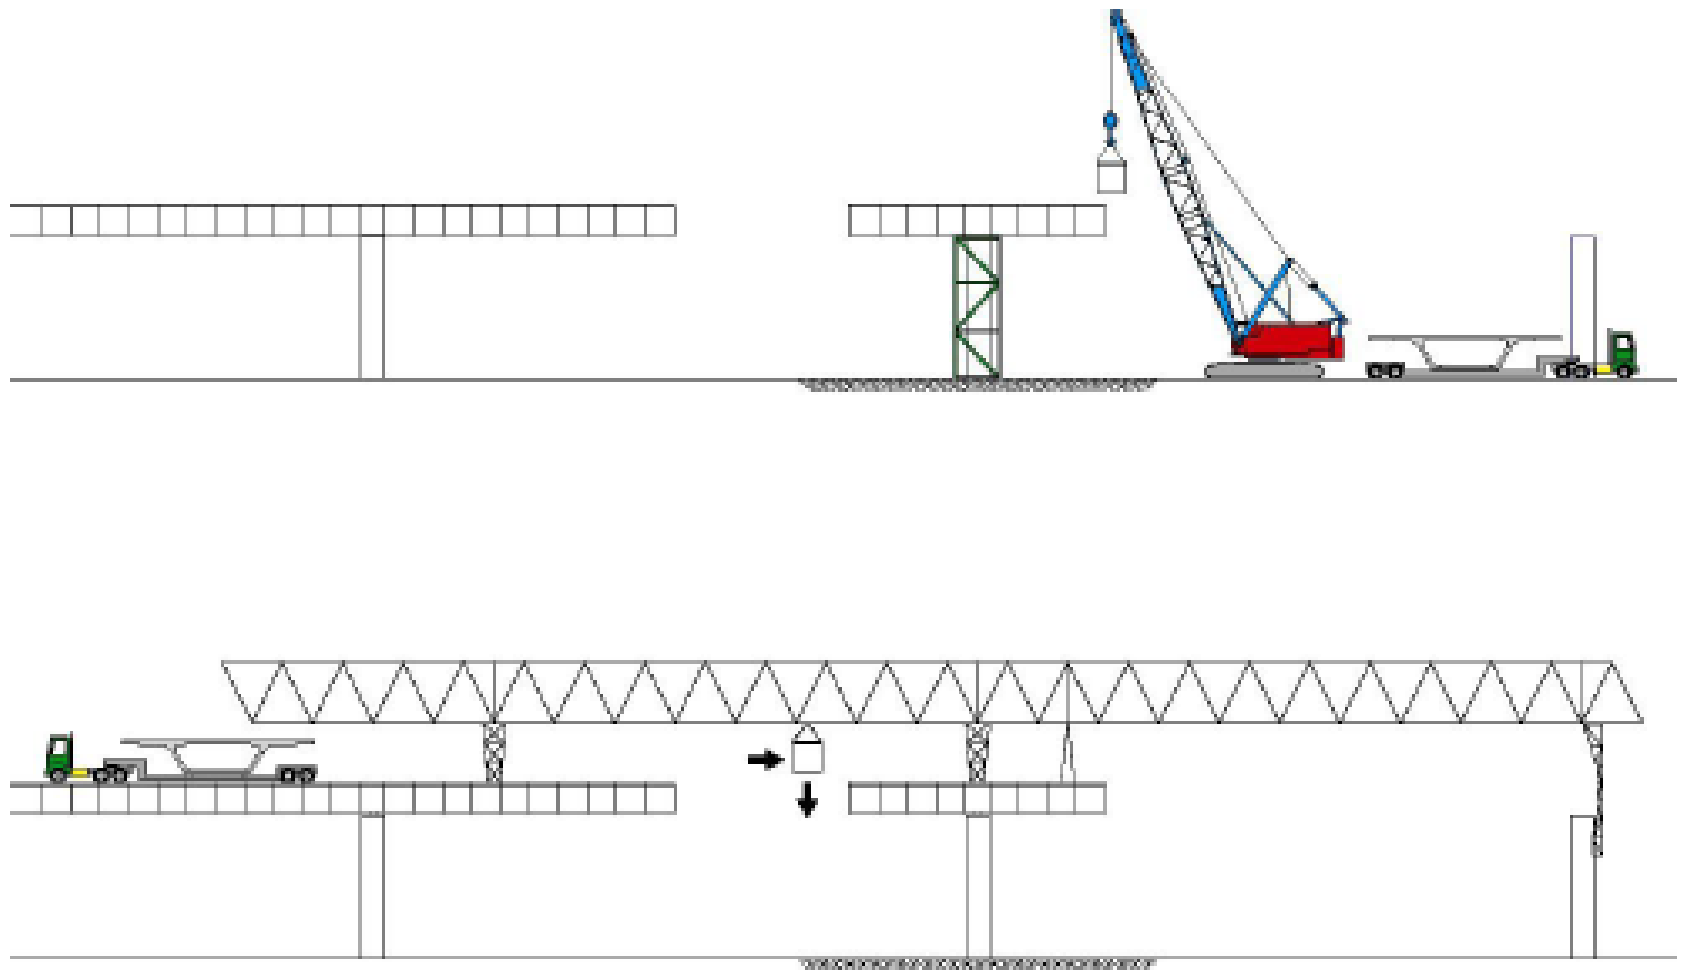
Precast Segmental Balanced Cantilever Construction.
